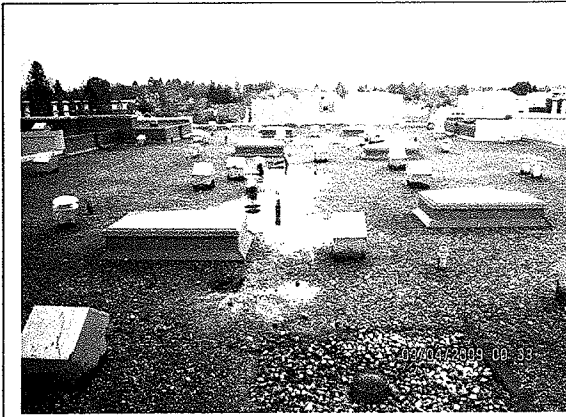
This shows some minor ponding in the area between two drains. With an organic membrane roof like this, we do not like to see water sitting for any length of time. This is something to consider when replacing the existing roof.
